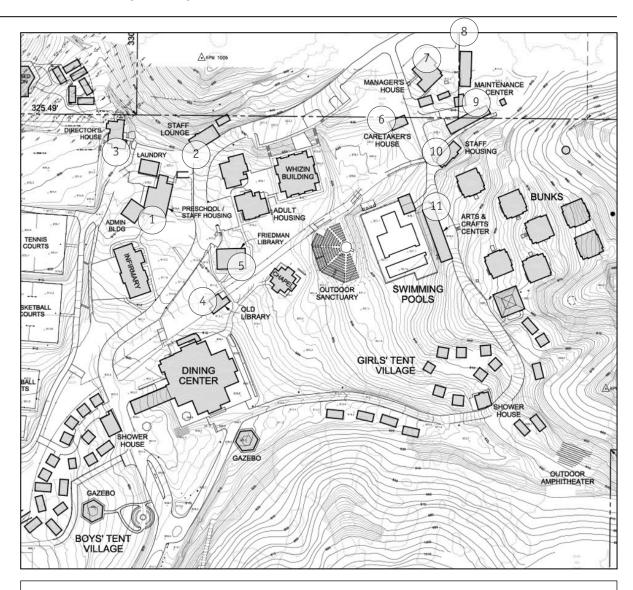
Site Plan [Source: Jane Carroll Design, annotations by SBRA]
